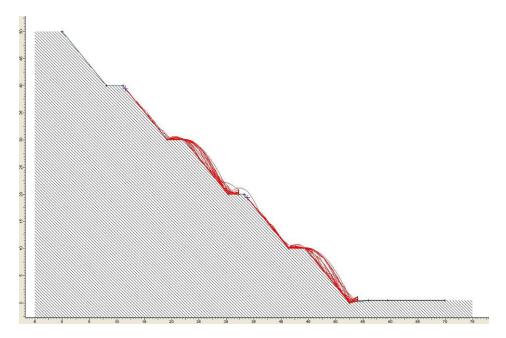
Cut Slope Configuration with Intermediate Benches, and Rock Fall Barriers
